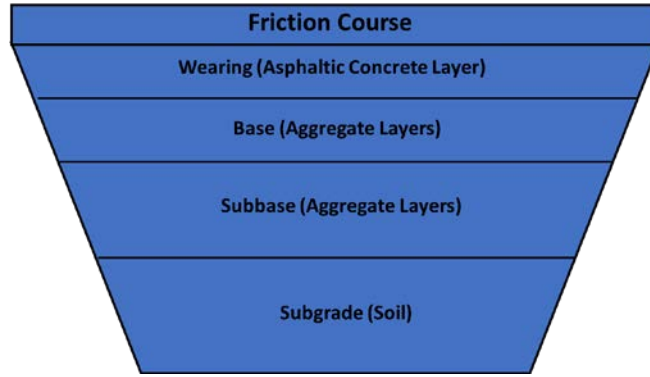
Layers of concrete pavement (adapted from Kar et al., 2020).
